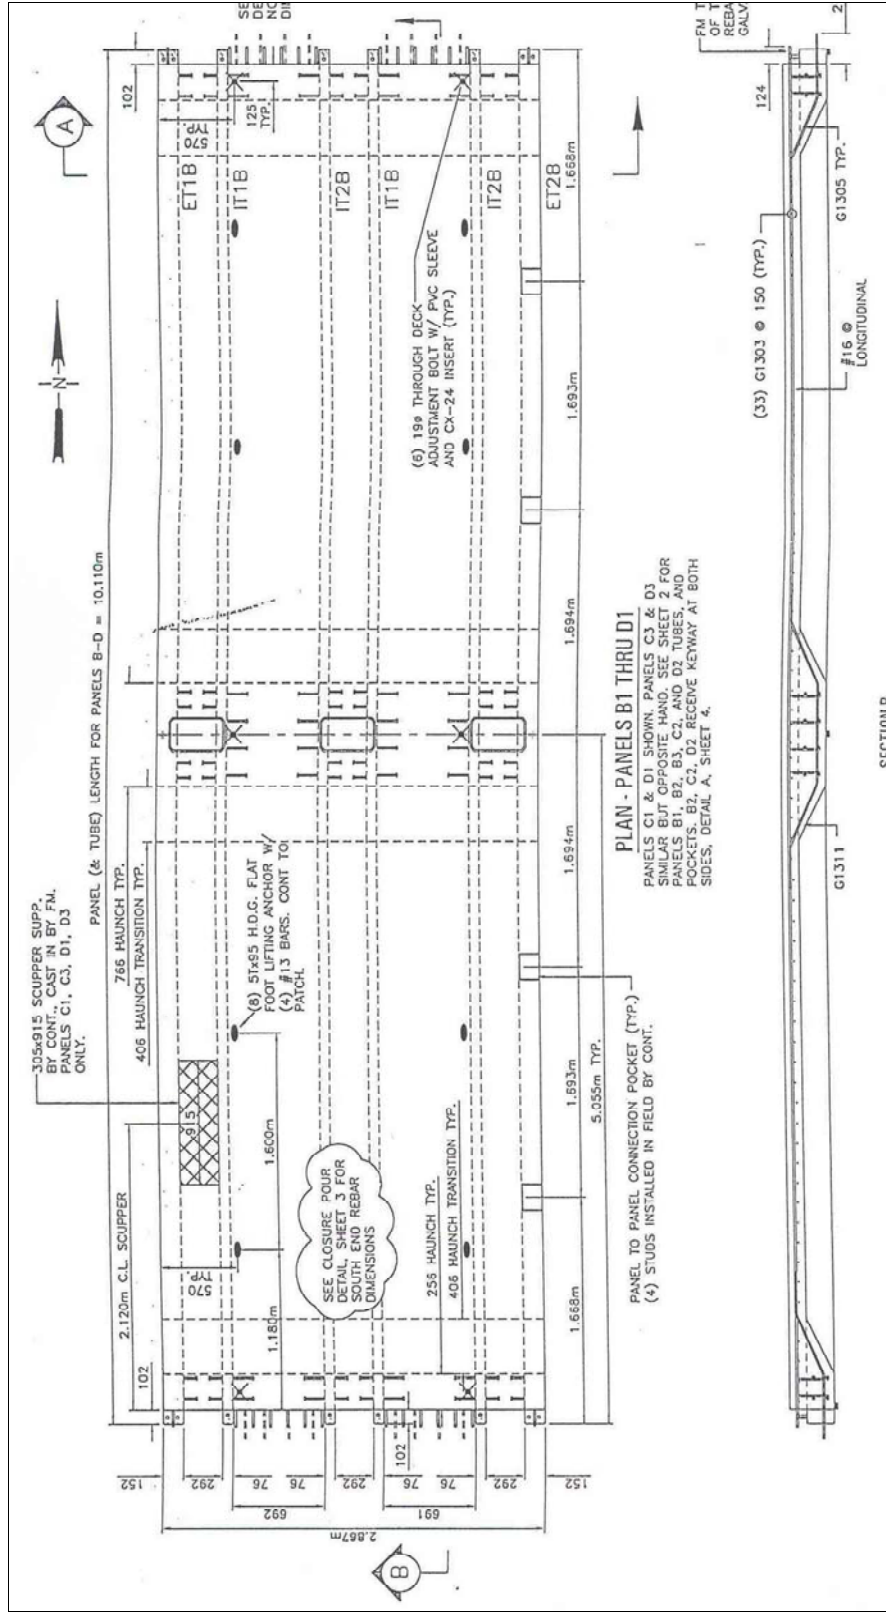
Panel plan view and section for bridge over Cascadilla Creek, Ithaca, NY (The Fort Miller Co., Inc., 2001)
